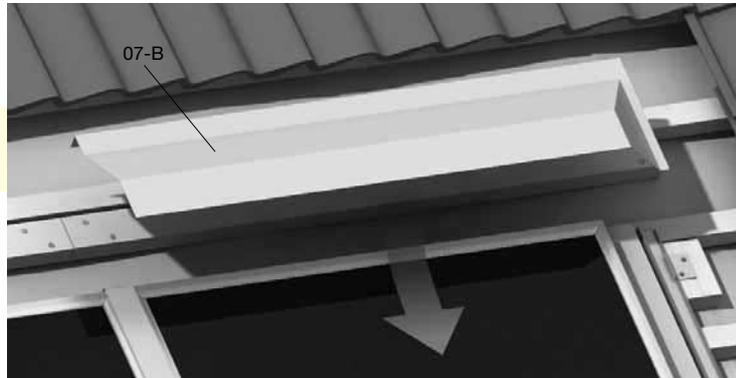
Fitting right Top Cover Flashing (07-B) to Collector
